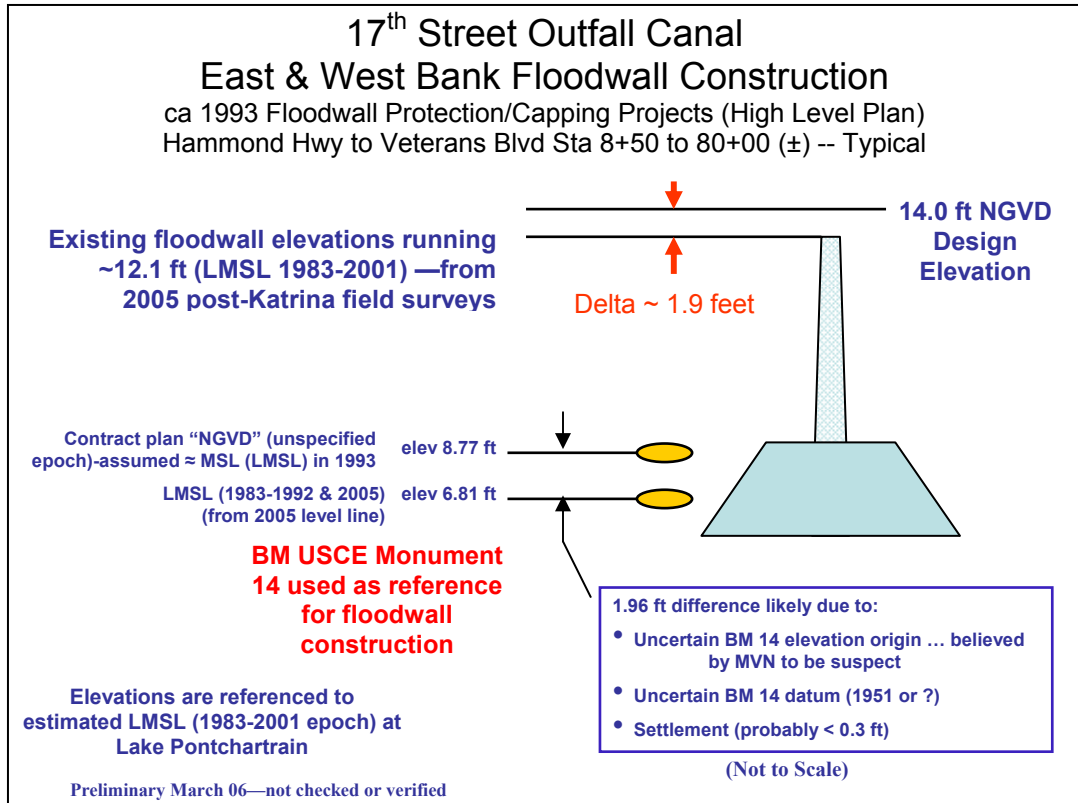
Design vs. Current Floodwall Elevation—East Bank 17th St Outfall Canal
